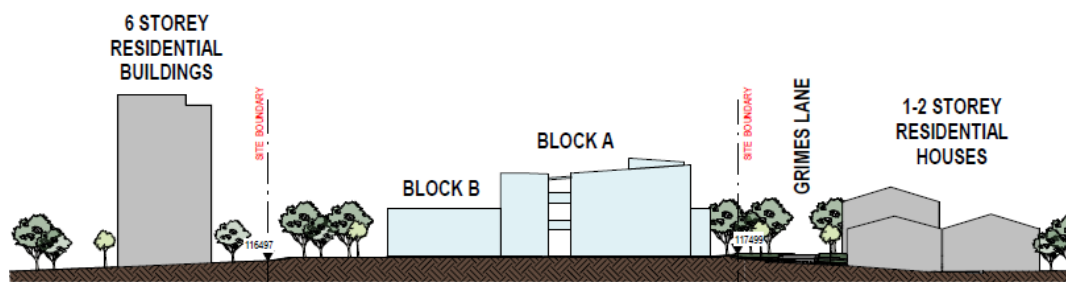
Short-section of site and surrounds (Source: PA Architectural Plans)
